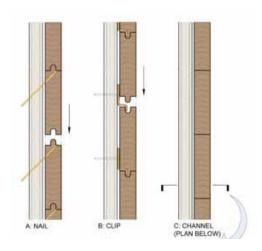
Siding construction detail. Source: (EPA, 2006)
